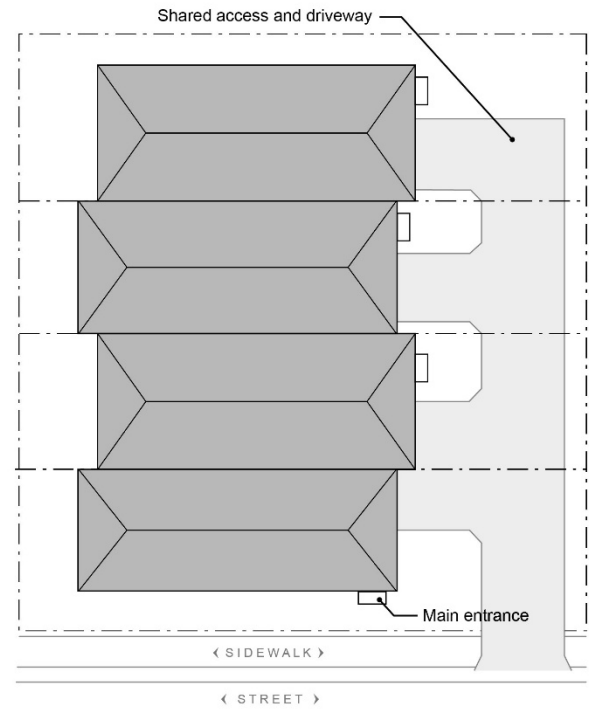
d. Townhouses with Access from Shared Driveway and Access Easement/Tract
